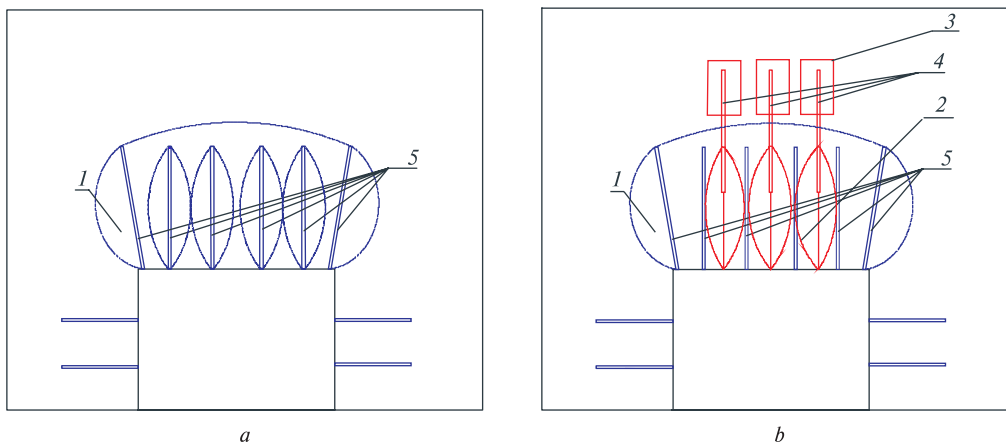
Using single-level (a) and combined (b) schemes of supporting the working roof:
